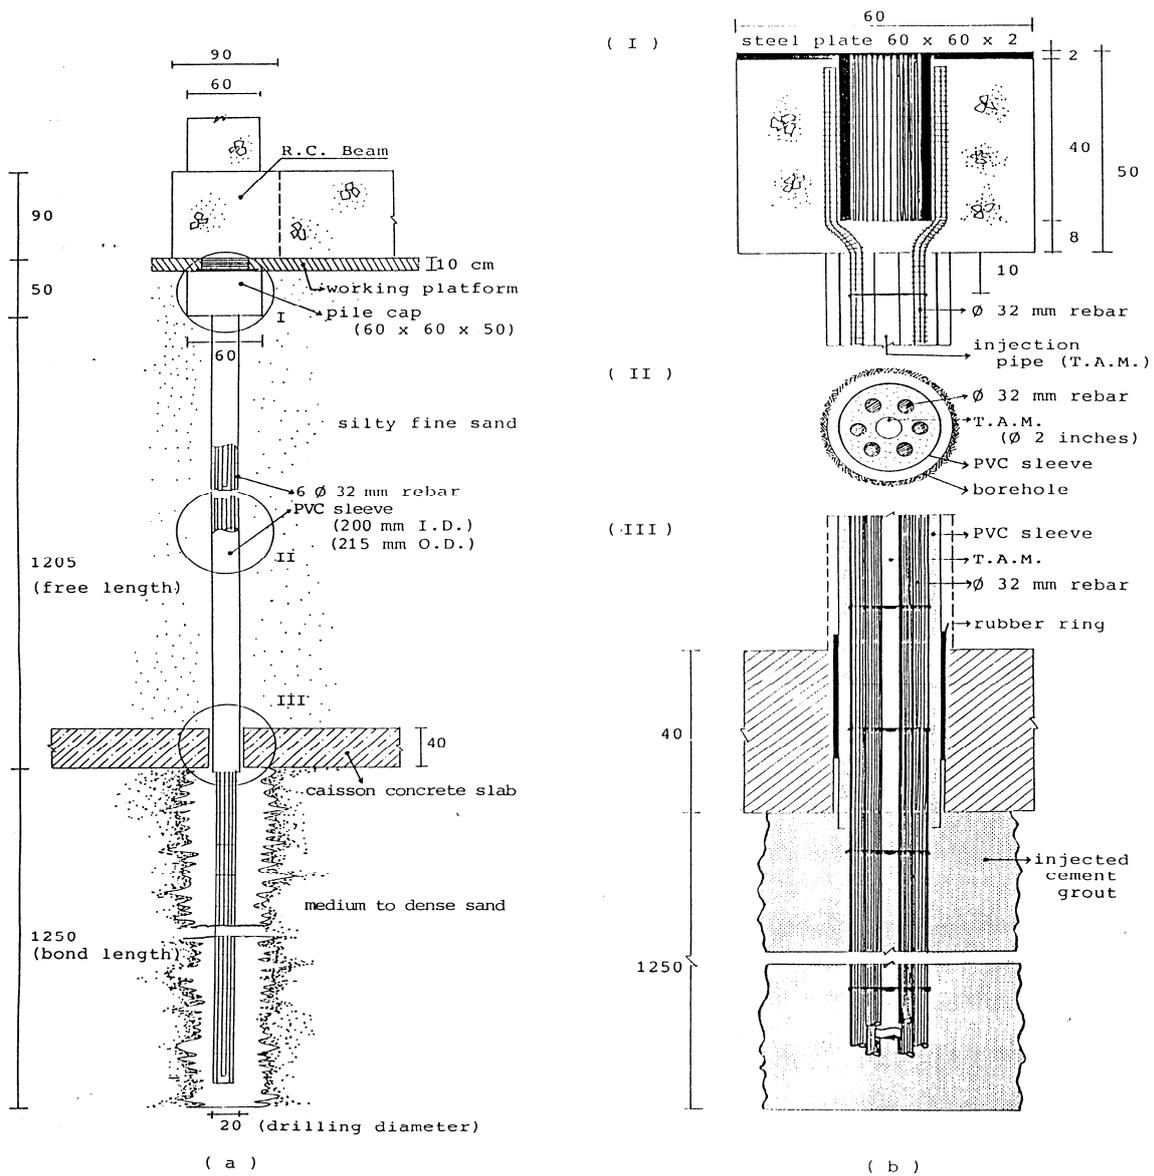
Detail Construction of the Repetitive Grouted Micropiles (RGM)
